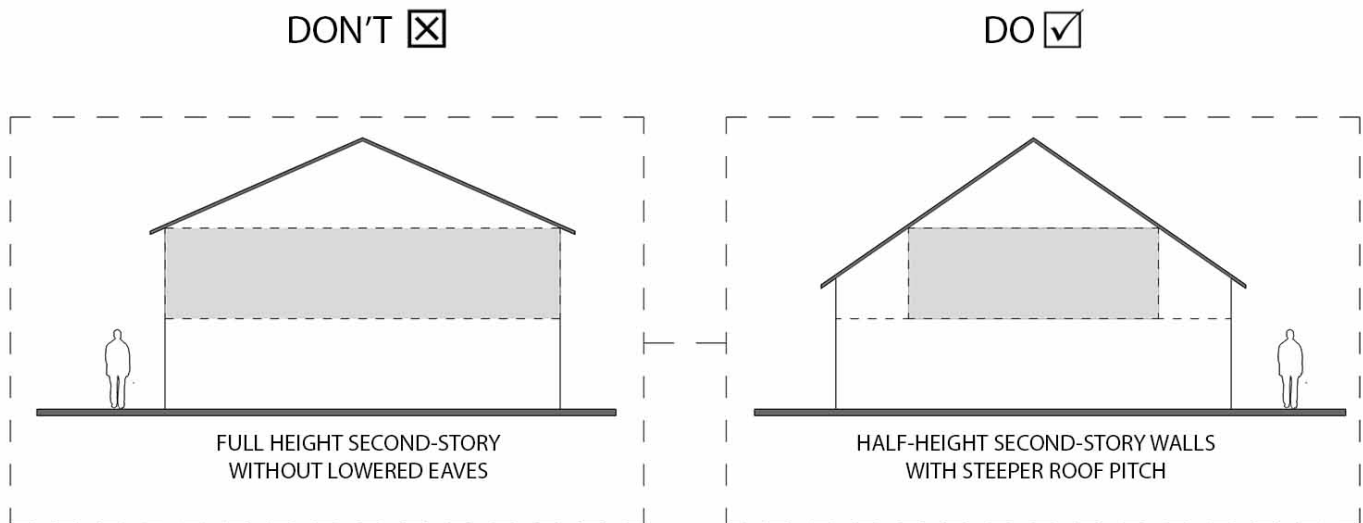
Lowering the eave line, such as half-height second-story walls with steeper roof pitch (with windows on the gable ends), is another design element that can minimize the scale of a two story building in an area surrounded by single-story buildings.
